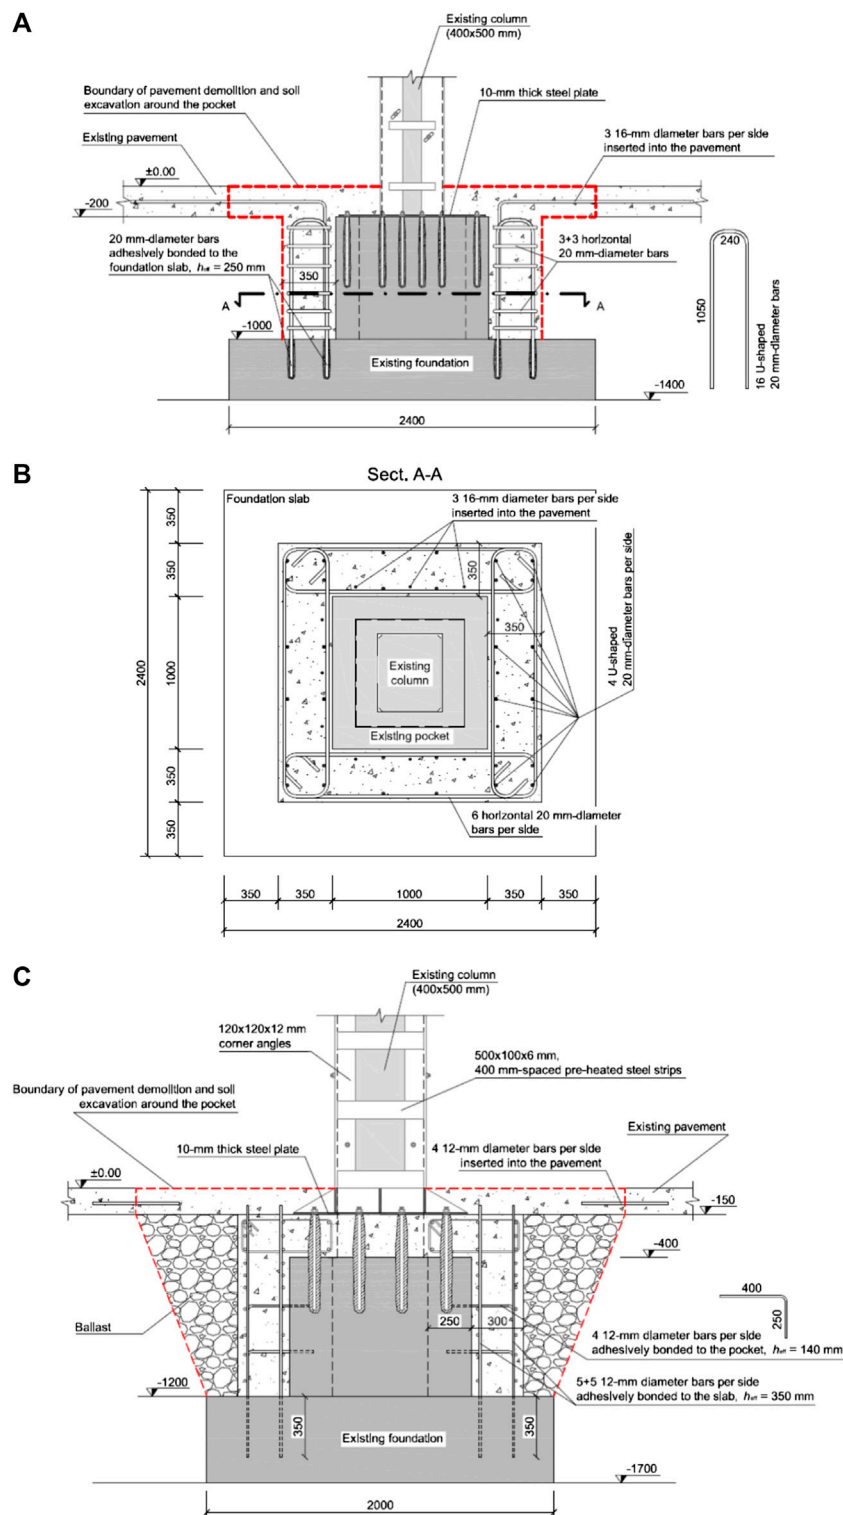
| Steel jacketing of precast columns in association with foundation strengthening: (A) vertical and (B) horizontal sectional views of pocket strengthened by a cast-in-place RC jacket; (C) RC jacket applied to the sides and top of the existing pocket walls and connected to them by means of bonded anchors. Dimensions in mm.
